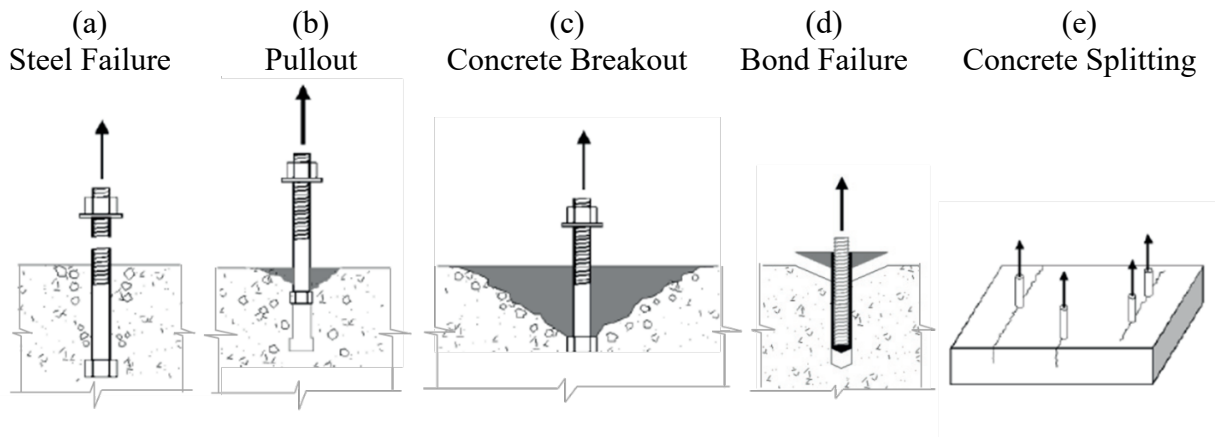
Failure modes for anchors under tension (redrawn from ACI 318-19)
